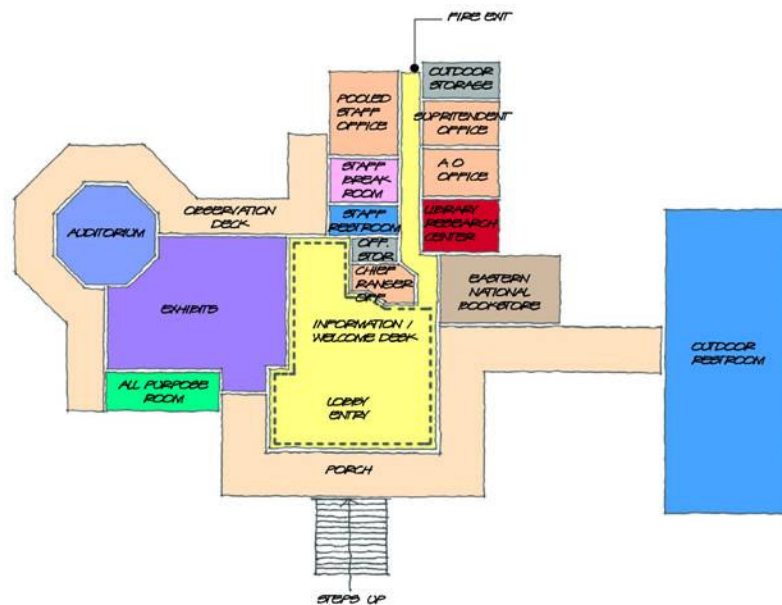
ALTERNATIVE E, WATERWELL ROAD/LADOTD PARTNERSHIP
